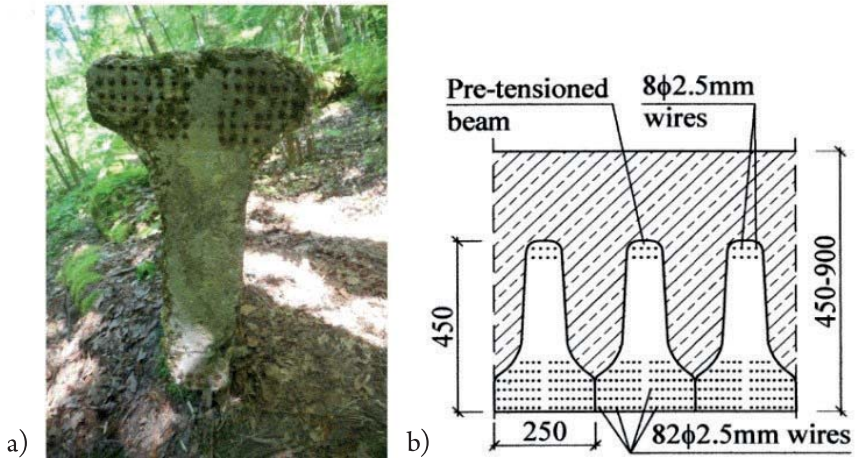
a) View of pre-tensioned beam cross section (own photo), b) slab cross-section
